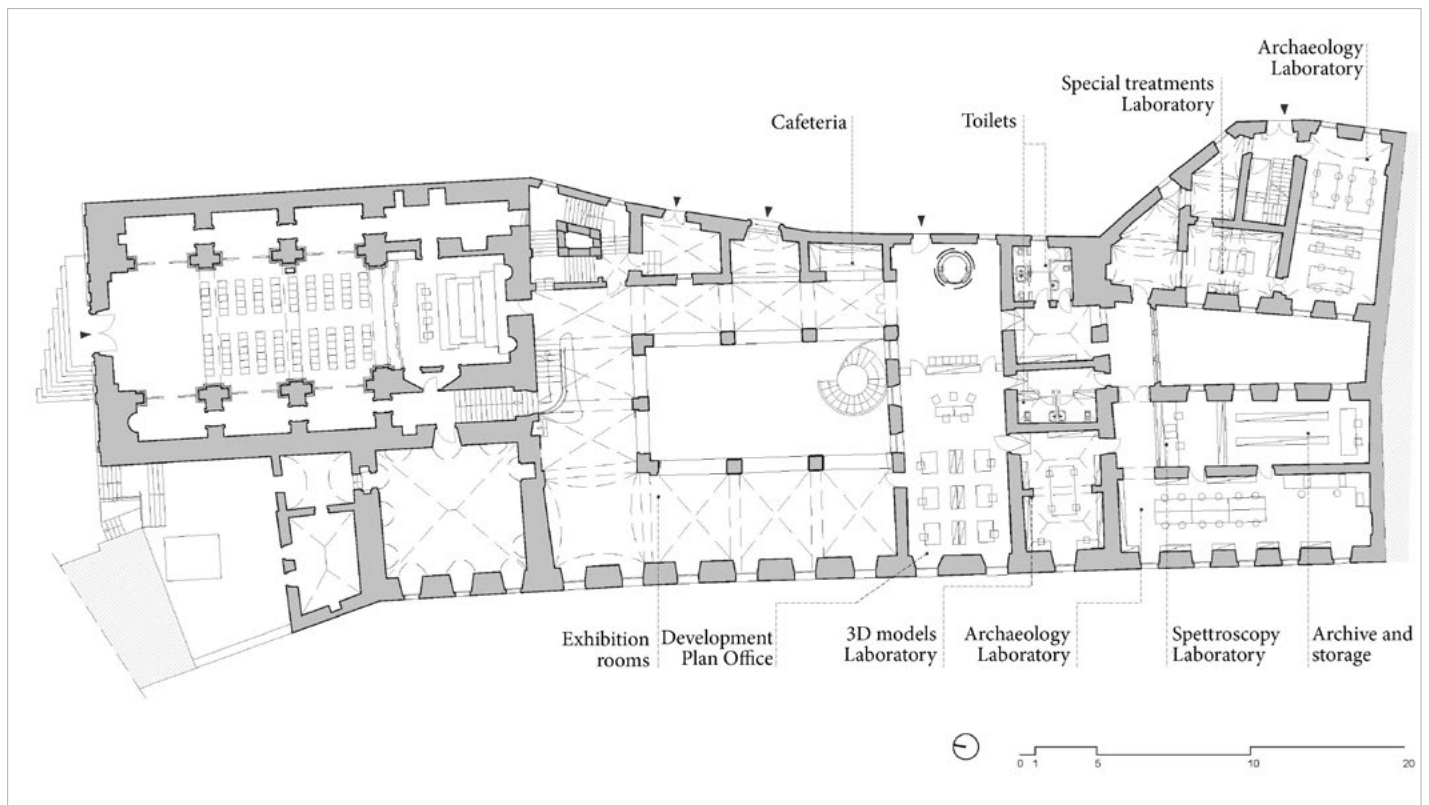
Cagliari, San Giuseppe Piarist College, plan of the ground floor at the level of St. Joseph Street, with new functions.
